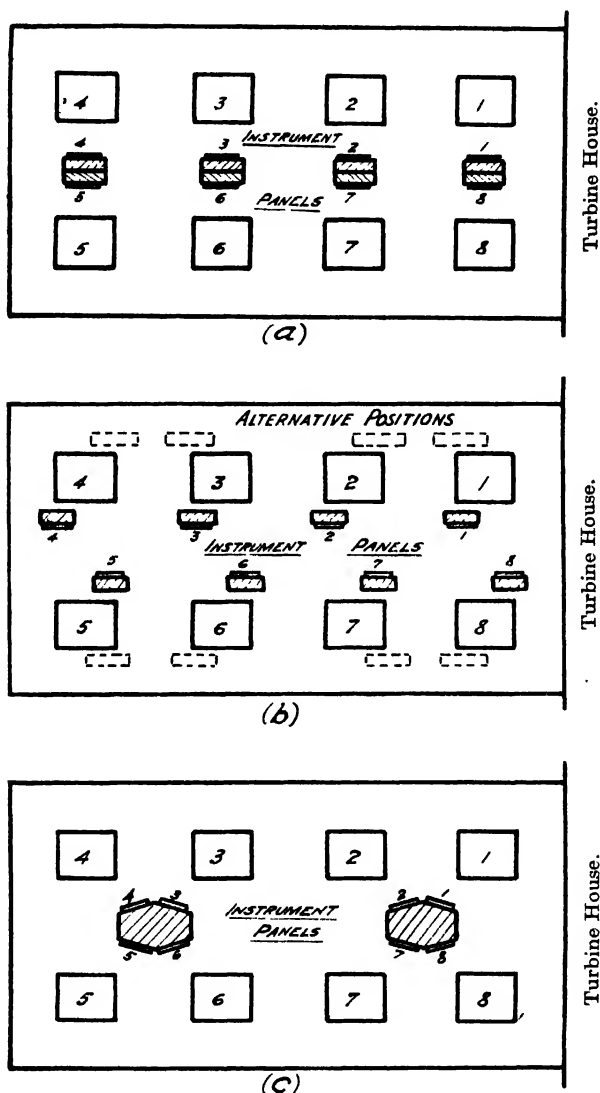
Alternative Arrangements of Instrument Panels on Boiler Operating Floor.
